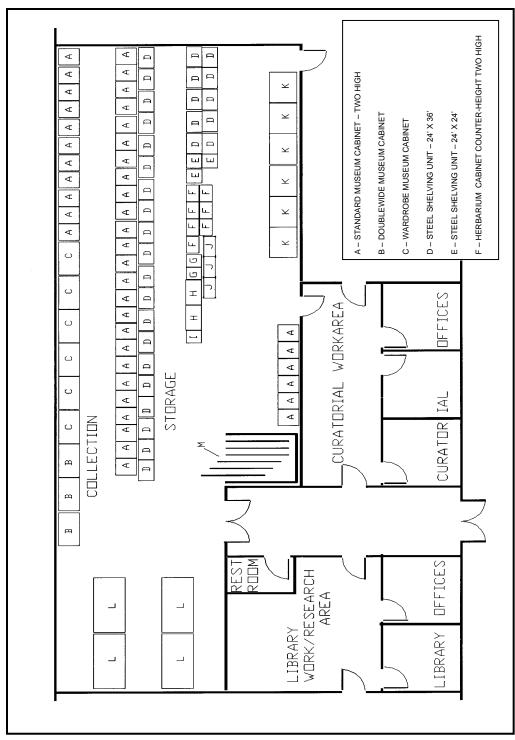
Sample Detailed Floor Plan of Museum Collection and Work Space
